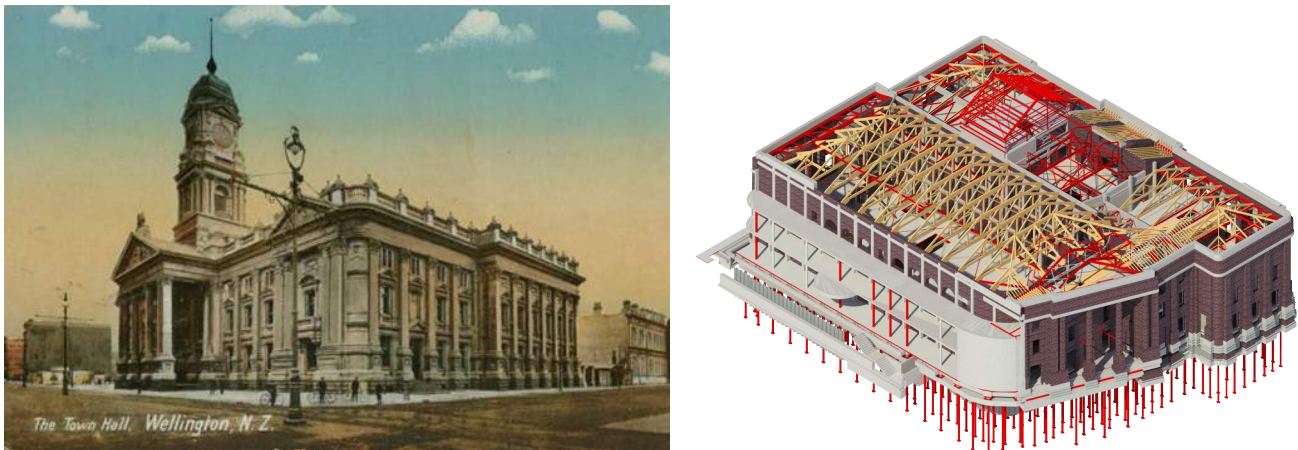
Original northern and eastern facades with clock tower and parapets (left) and 3D Revit model of the proposed strengthened building illustrating the primary structure and new foundations (right)
